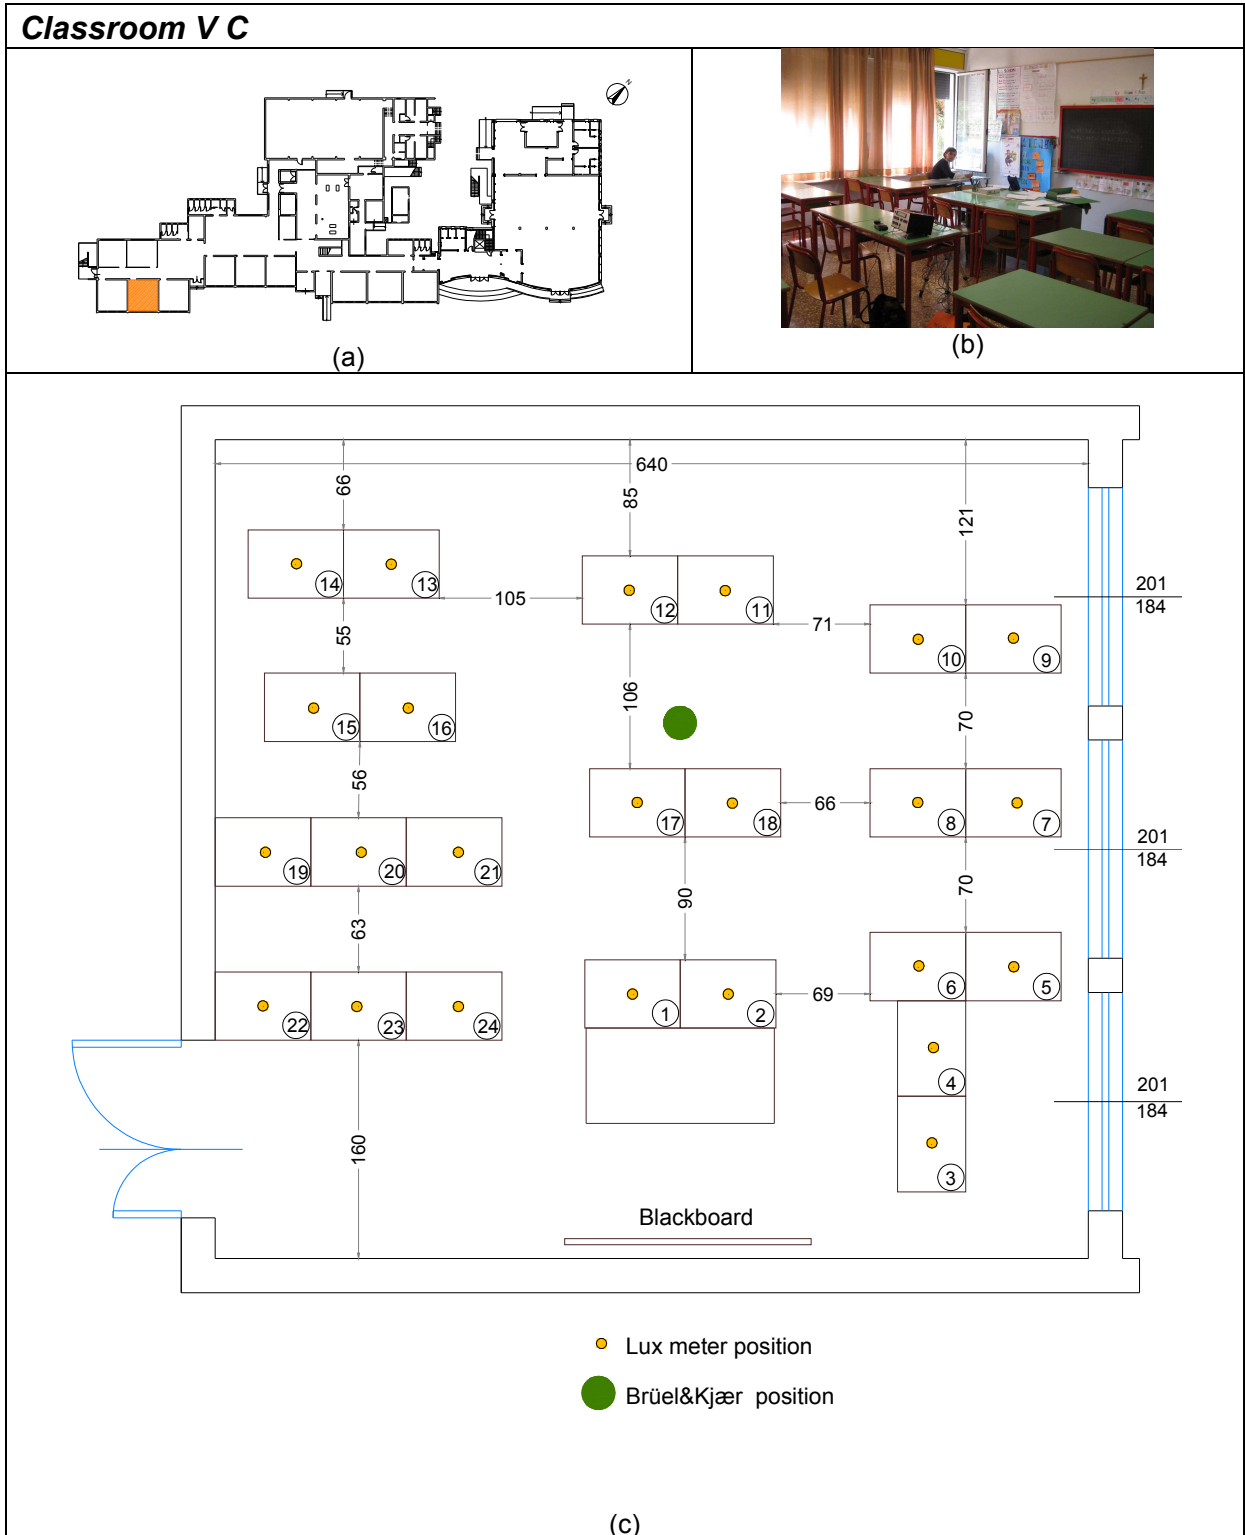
Classroom V C (Noventa di Piave): key plant (a); photo (b); desks layout and position of the Indoor Climatic Analyser Brüel&Kjær and of the Minolta luxmeter (c)
